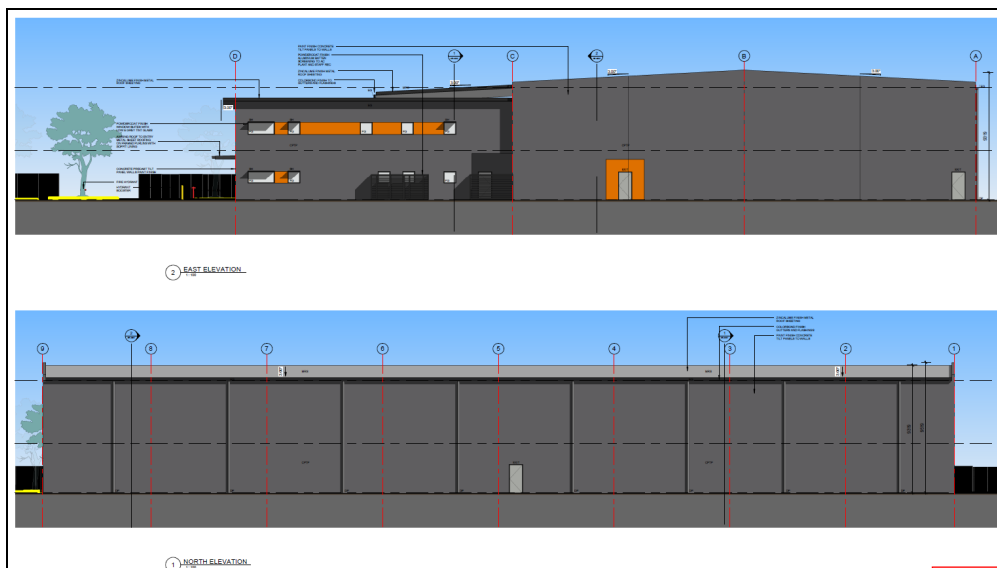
Elevations (East and North) (Source: Multi Span Australia Design Construct)
